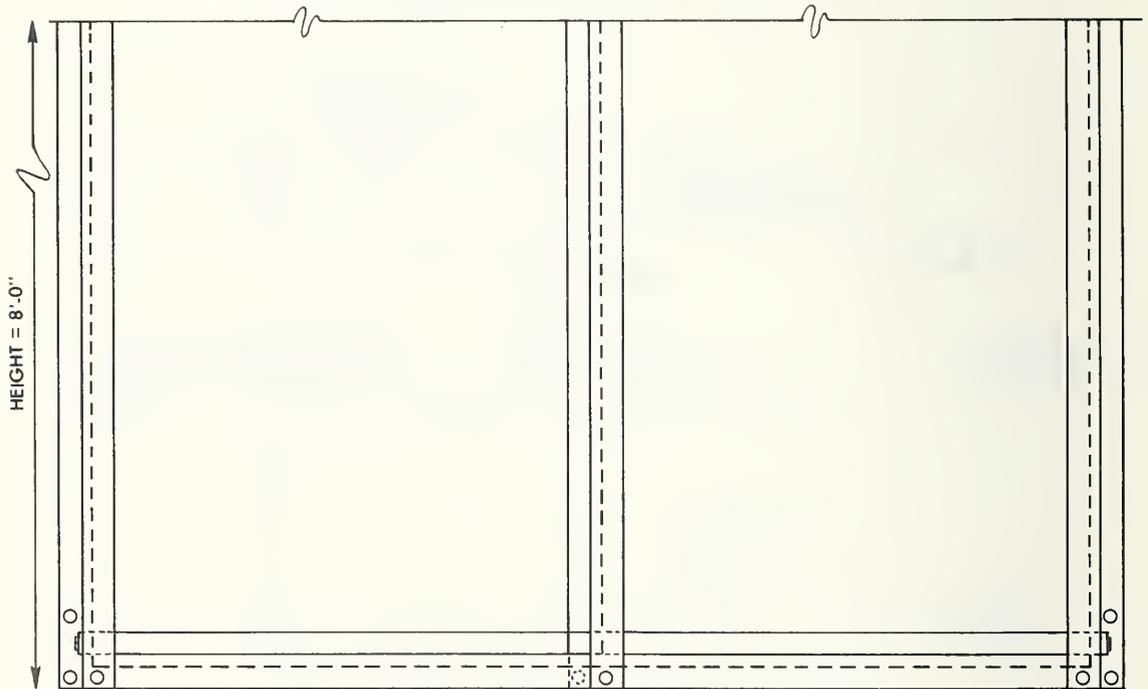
Wood-frame construction test panels (WFFR, WFTH).
